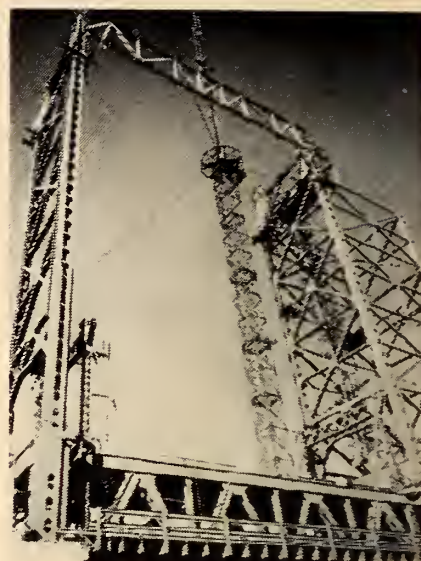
20 ton tower derrick used to construct the upper St. Lambert bridge.
